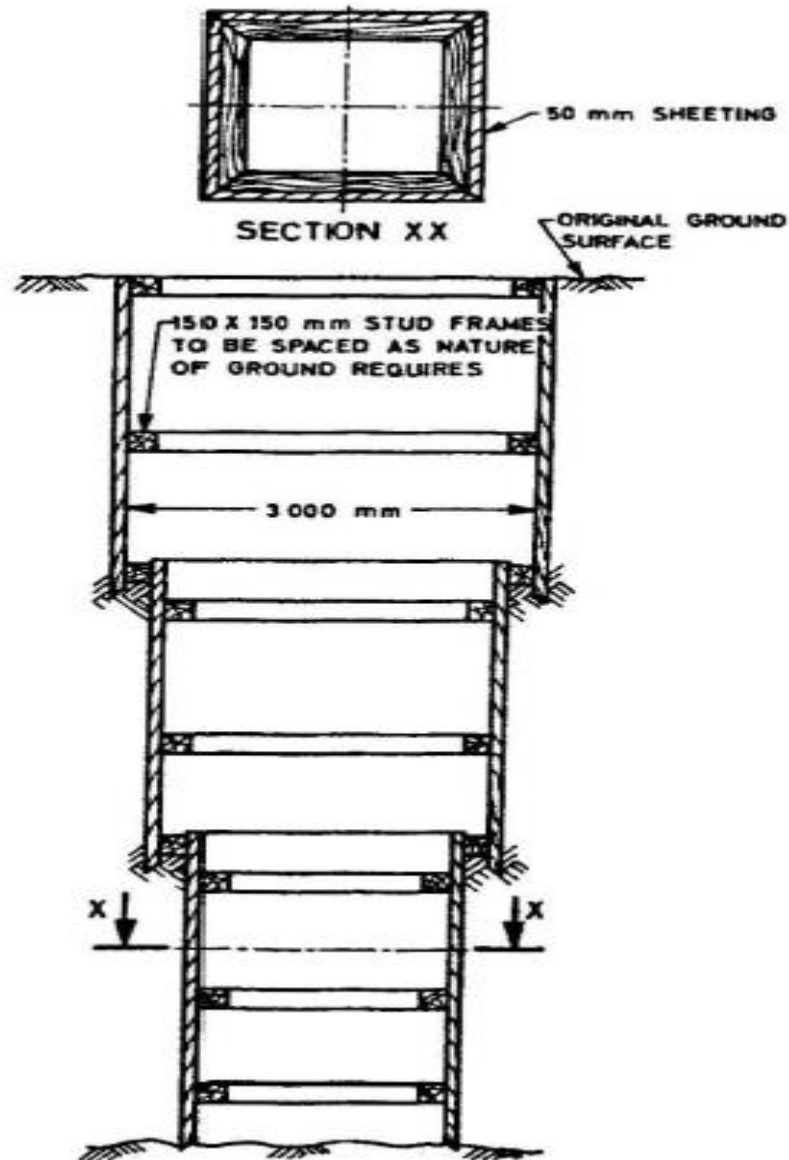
Typical test pit showing arrangement of sheeting and bracing (illustrative sketch).
